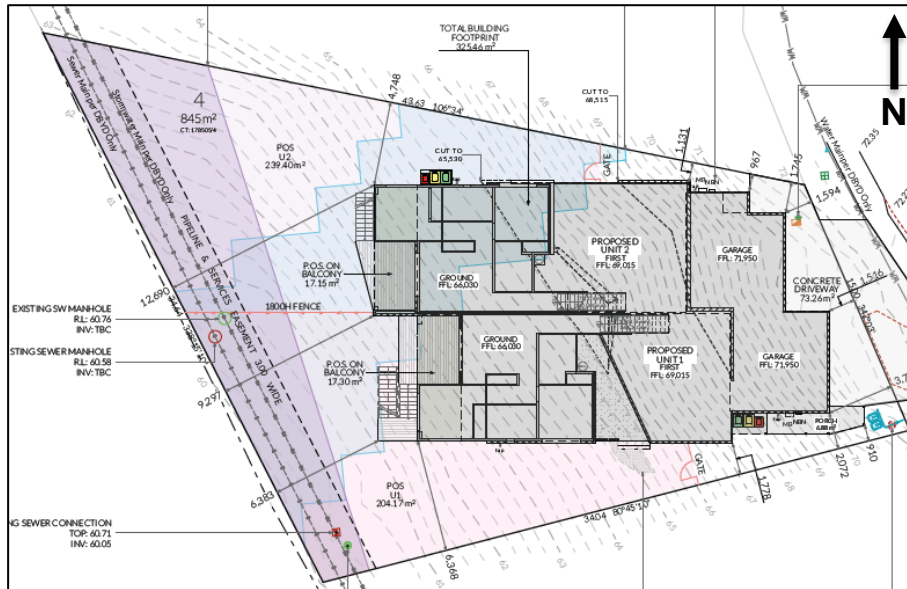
Part of Proposed Site Plan A.02 by Pinnacle with flood prone areas shown relative to proposed buildings
